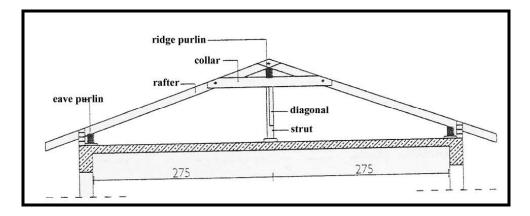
Structural members in a hip roof construction (Toydemir, 2004:40).
